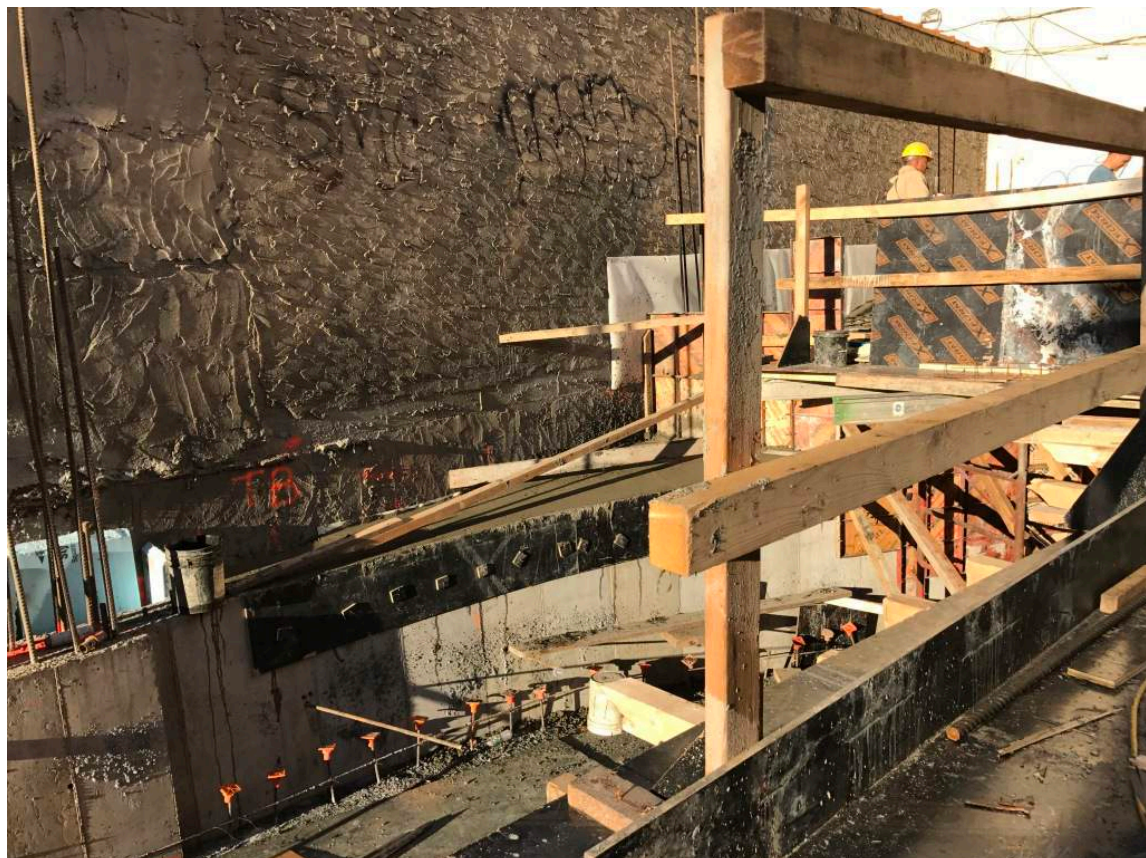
View of the concrete installation in the northern portion of the Site, facing north.
